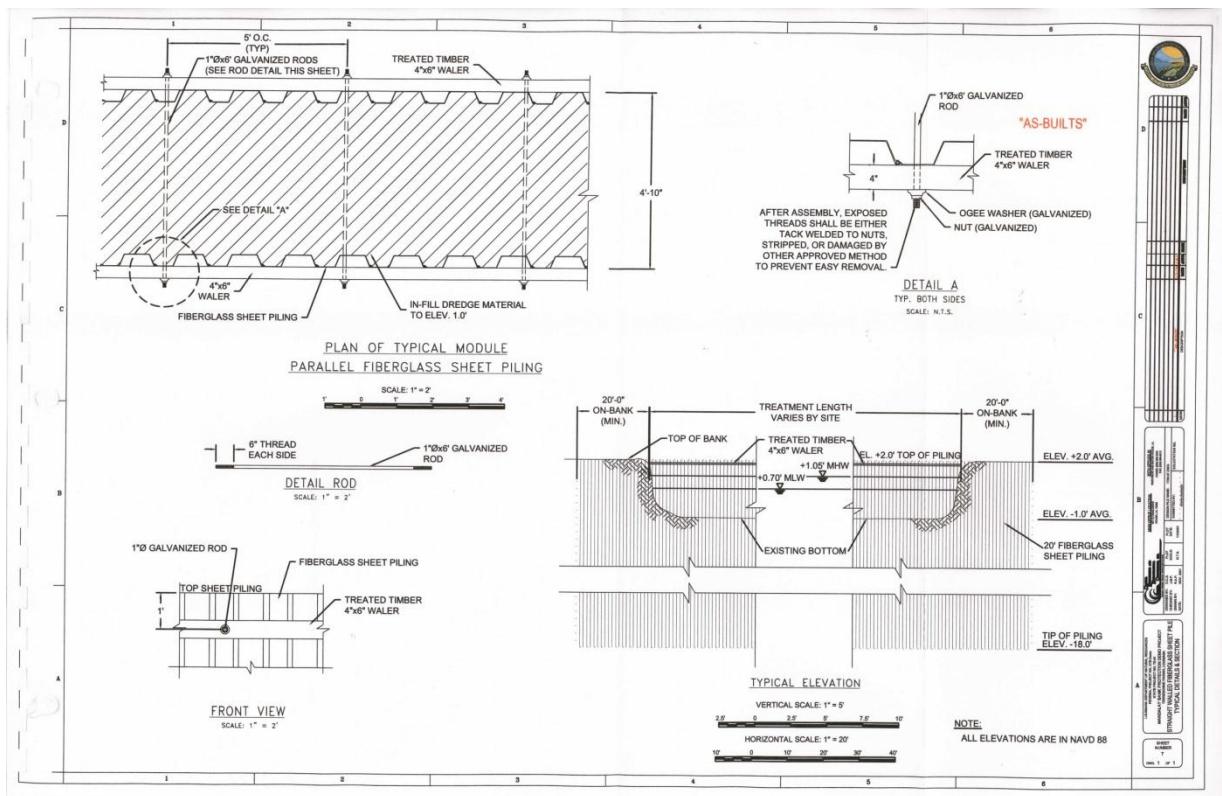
Typical cross section and aerial view depicting the Mandalay Bank Protection Demonstration (TE-41) project's straight-walled fiberglass sheet pile (V) structures.
